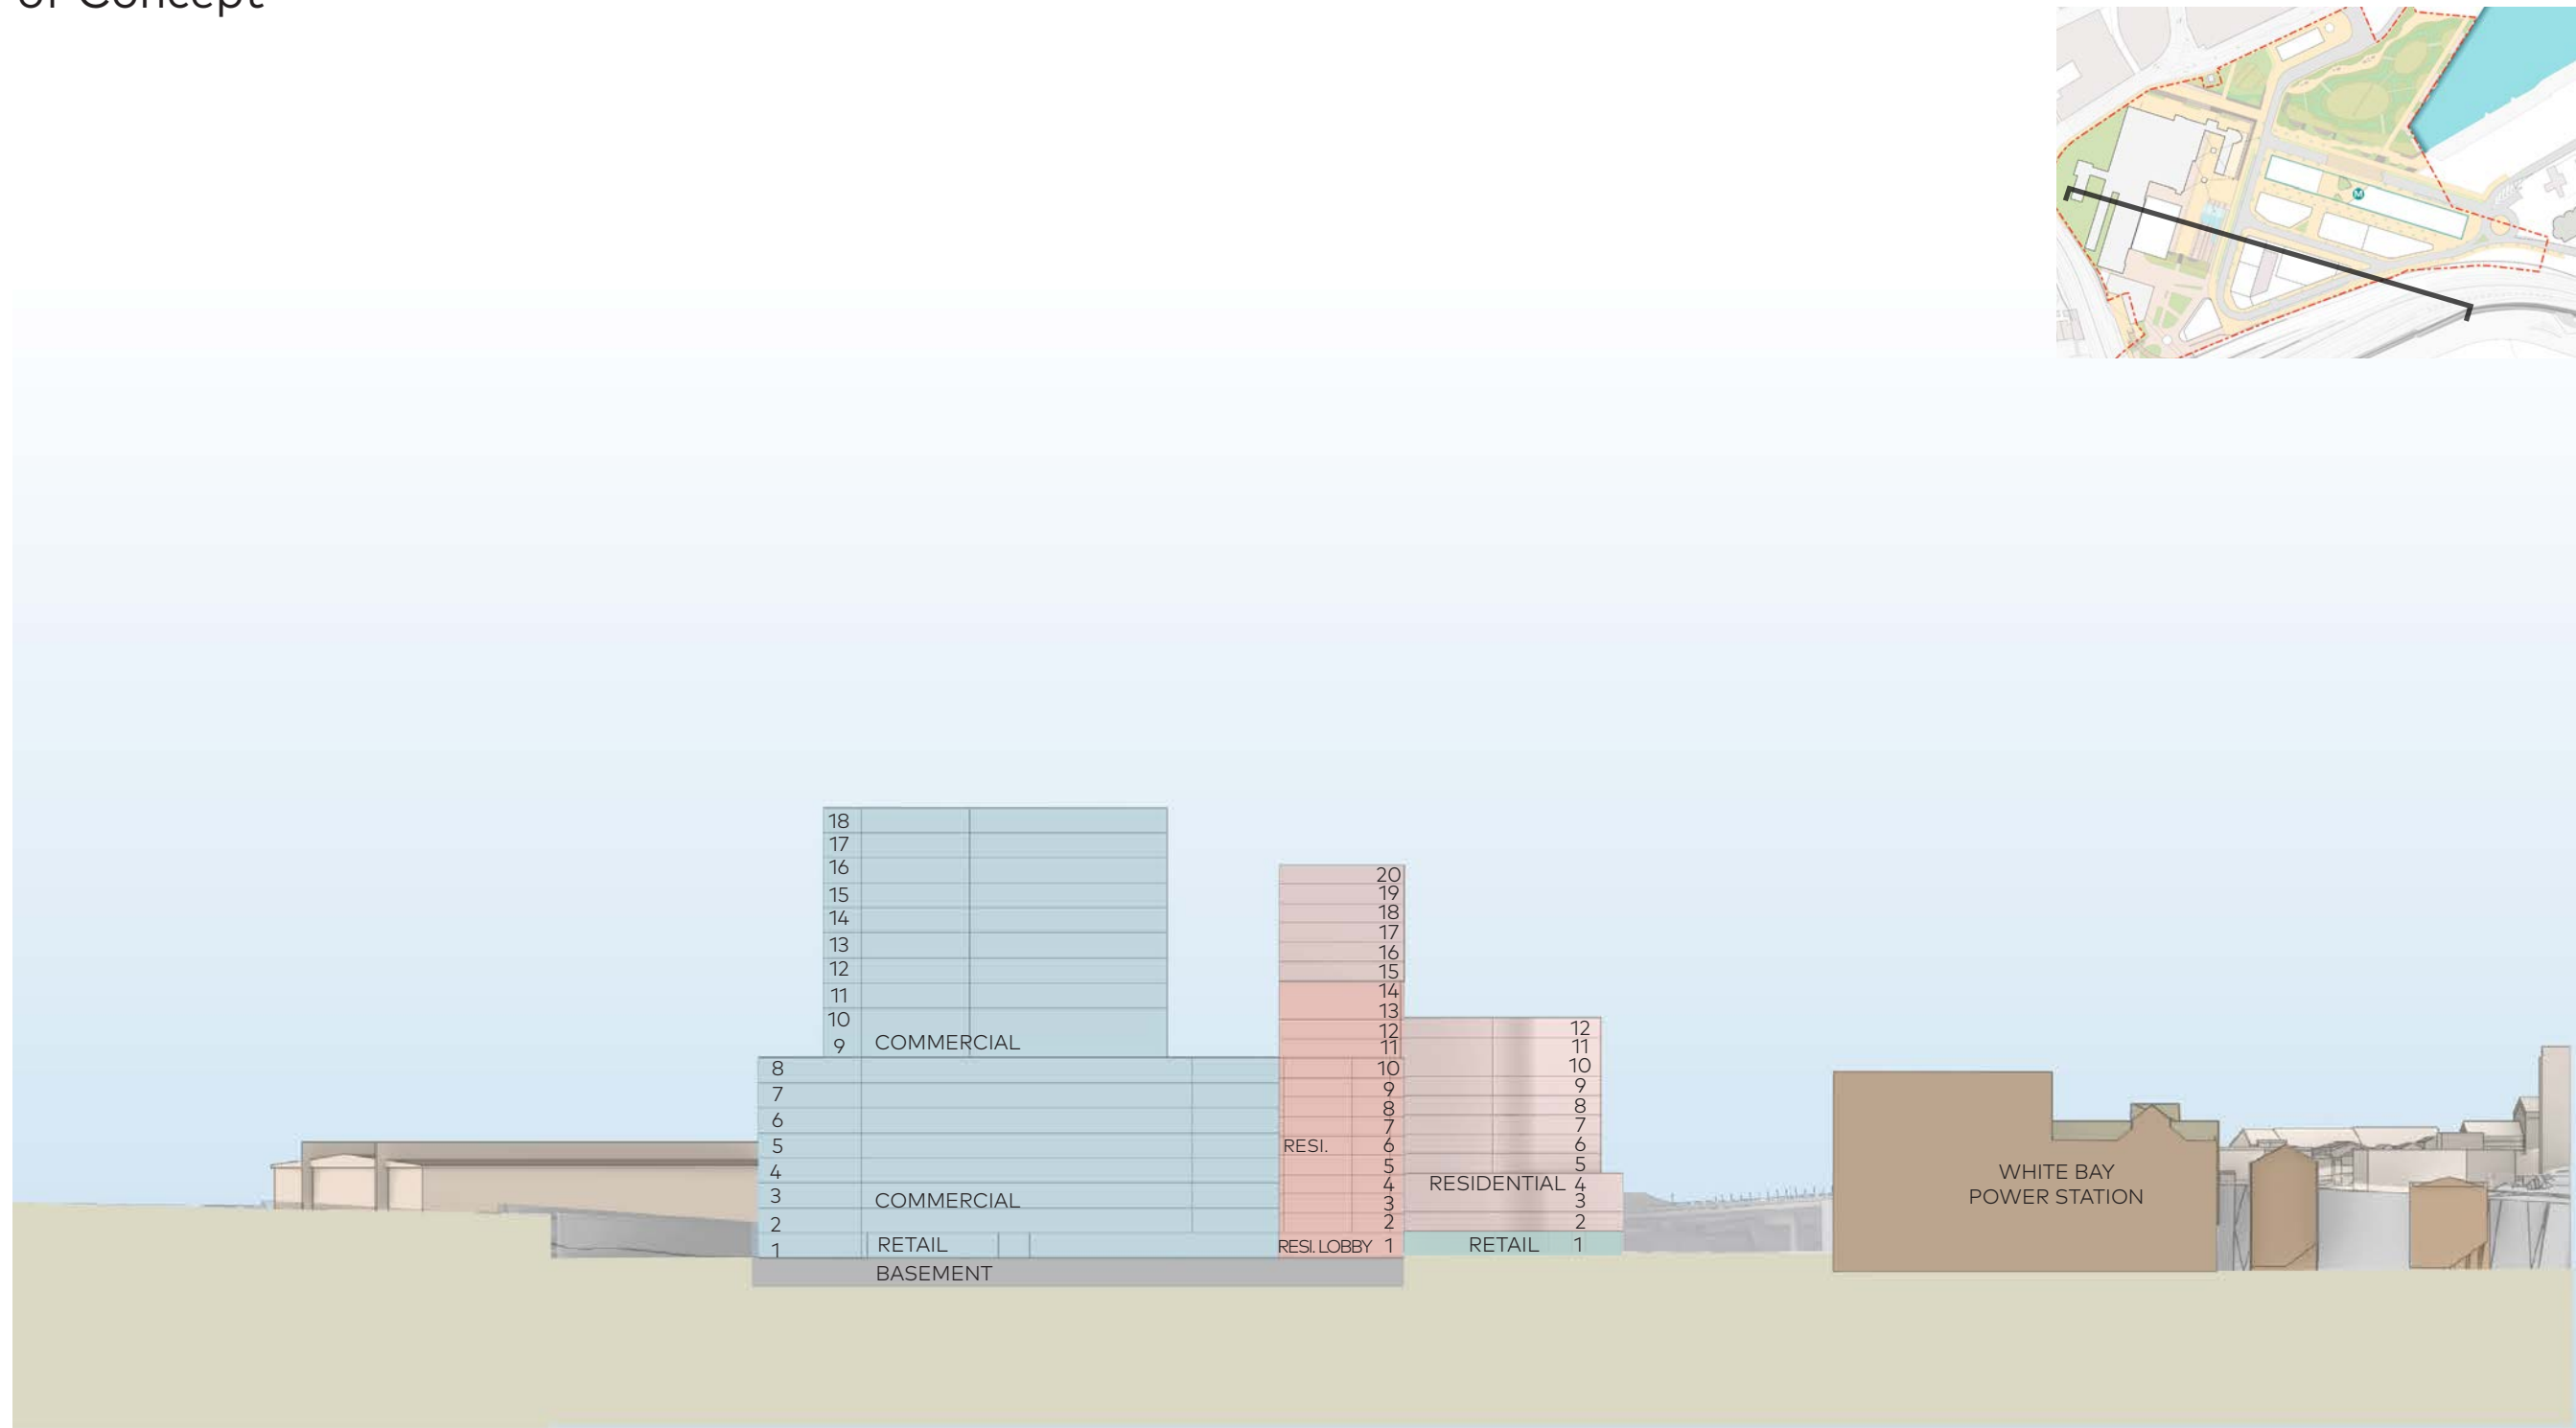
Section looking south through Southern Development Parcel, Boiler House and White Bay Power Station
